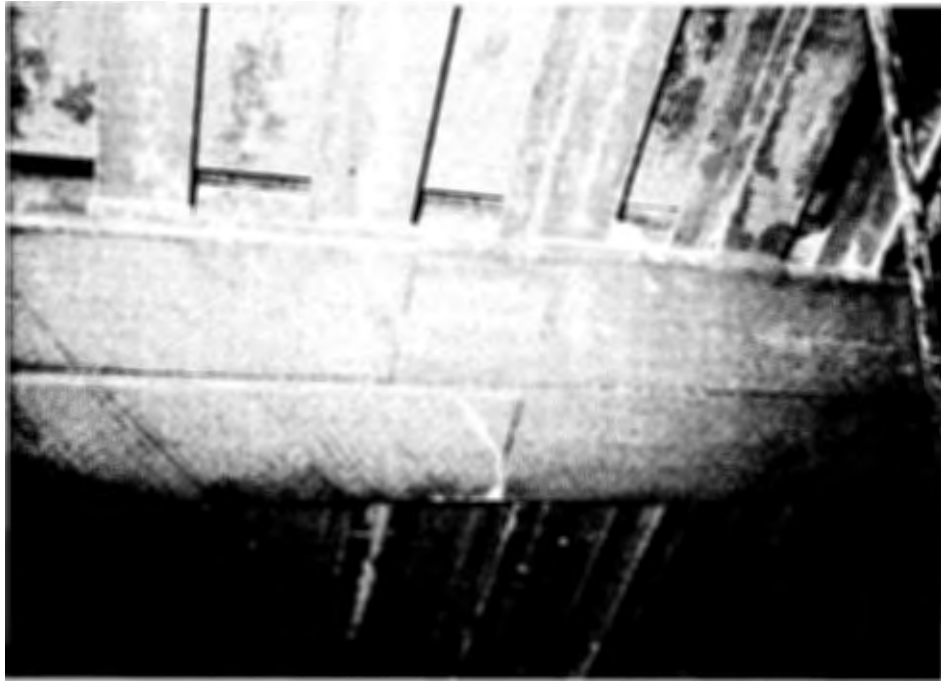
View of cover plated longitudinal girders and floor beams of adjacent single track bridges.
